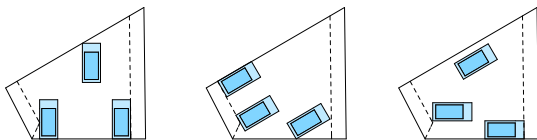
| Site configuration - four towers - Six dwellings - 42dph
